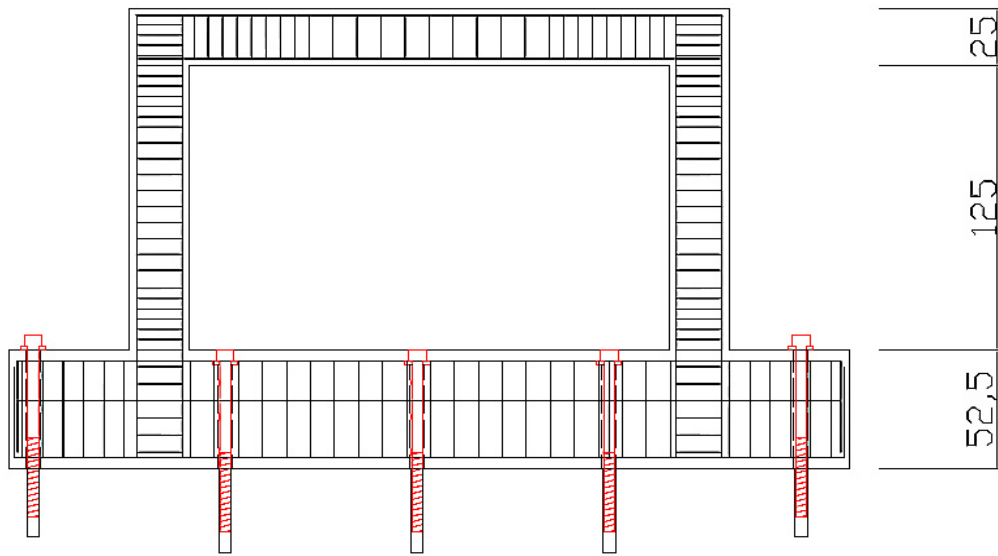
Detailing of transverse reinforcement (the units are cm.)
